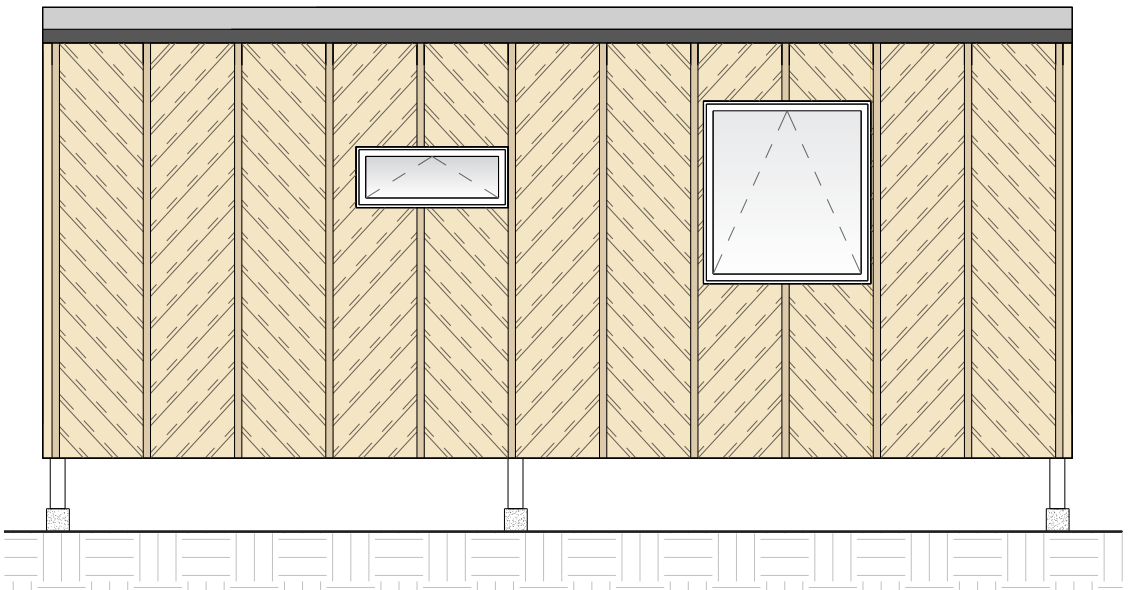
ELEVATION A-A PRIOR TO THE BUILT. SCALE 1:50
